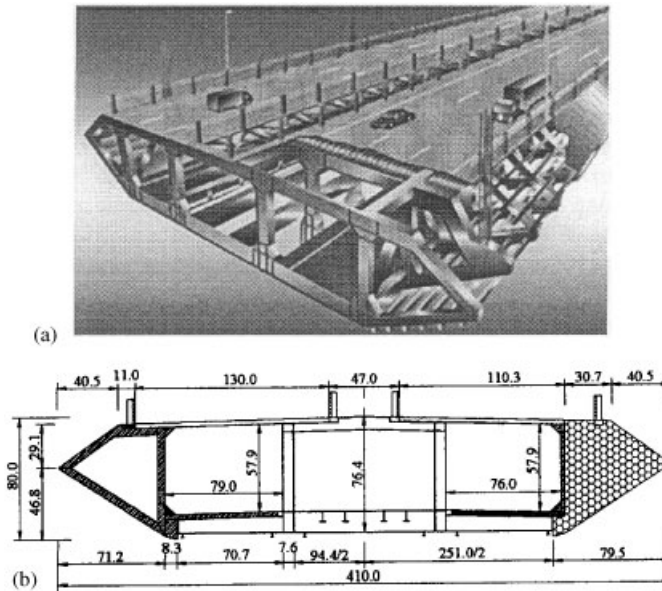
Tsing Ma suspension bridge deck: (a) schematic diagram; and (b) cross section.
